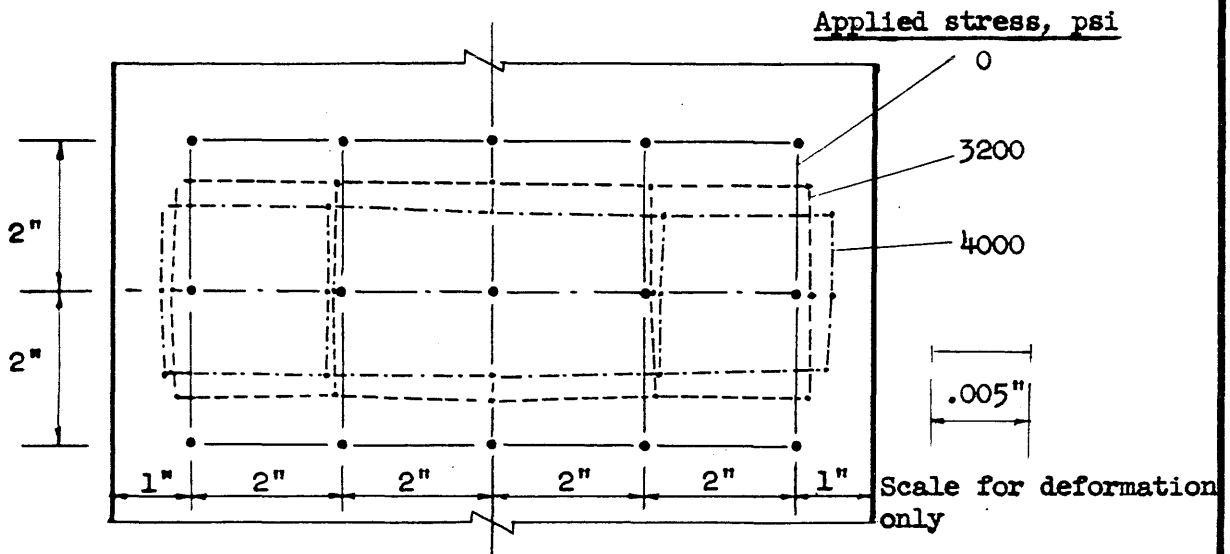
INSTRUMENTATION FOR THE SPECIMENS WITH 5 BY 10-INCH CROSS SECTIONS
